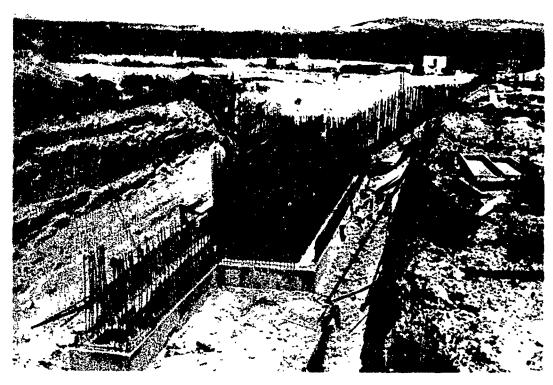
Structure II-1, base slab poured; interior formwork partially erected (May 27, 1957).
